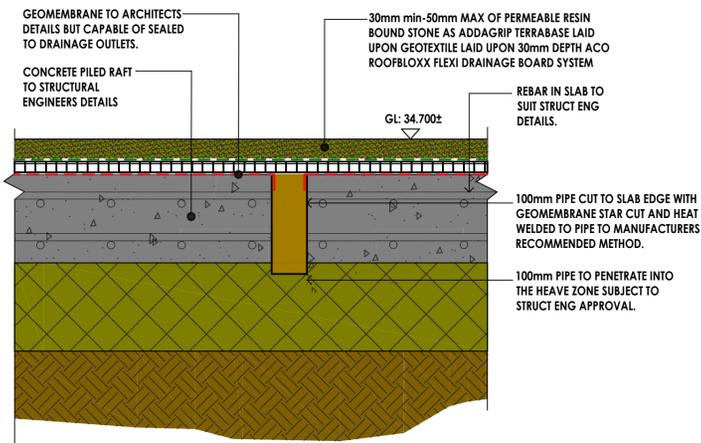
INTERNAL DRAIN POINT UNDER RAFT
